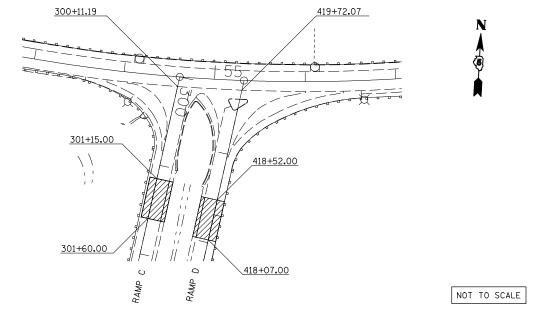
DETAILS FOR RAMP INTERSECTION RESURFACING TRANSITIONS & BUTT JOINTS
